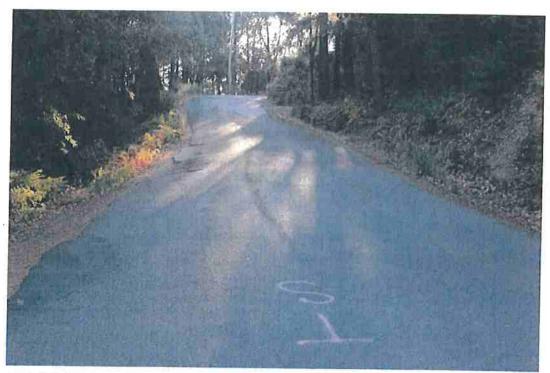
Mile 1.8: 20-ft road width with 2-ft shoulders.
